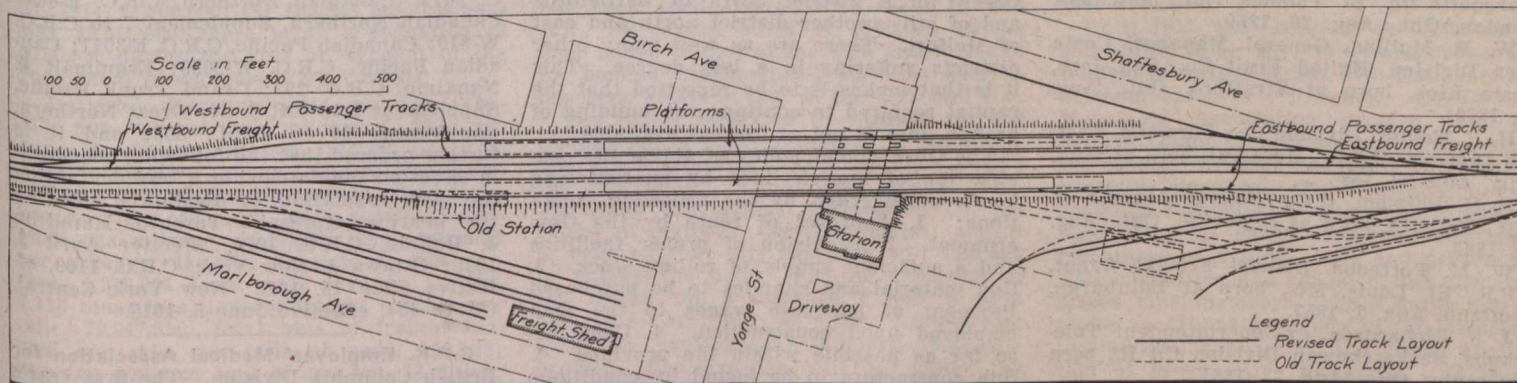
Track Arrangement in Vicinity of New North Toronto Station.
